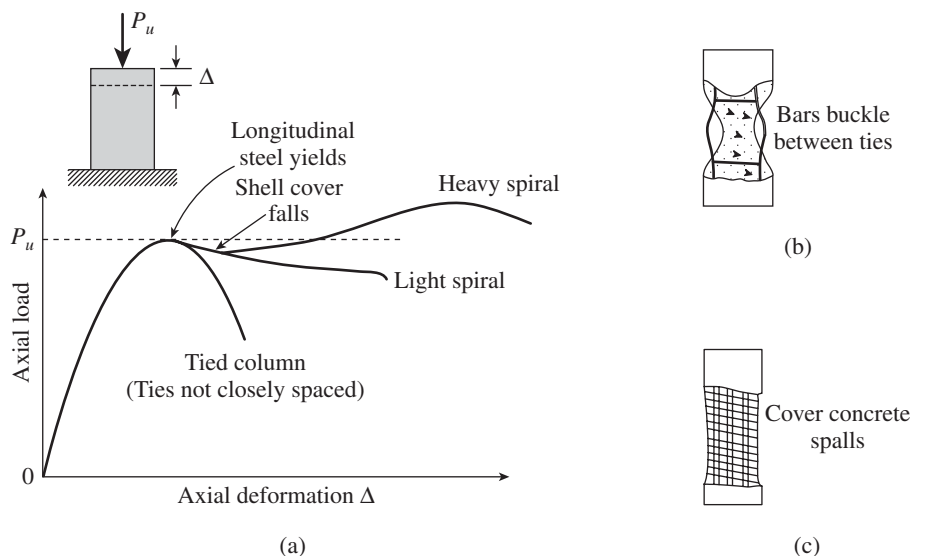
Behaviour of short columns (a) Load-deformation curve (b) Tied column (c) Spiral column
